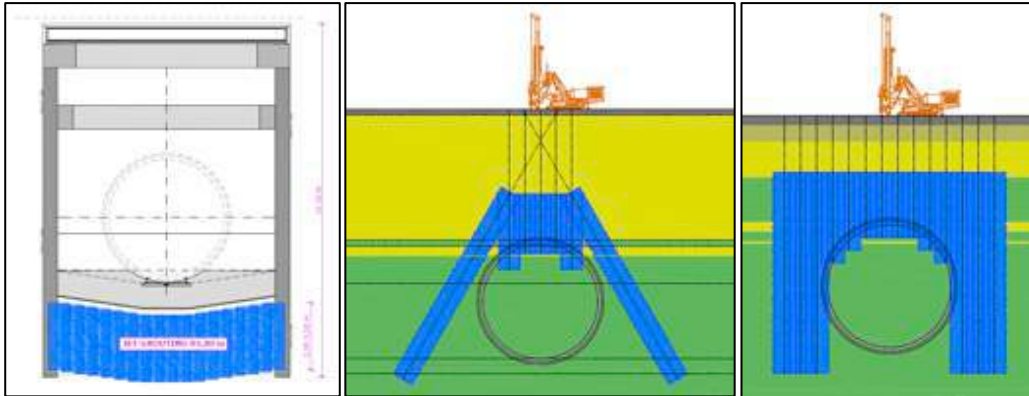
Typical sections jet grouting treatment: a) parallel D-wall tunnel area; b) and c) airport runway area.
